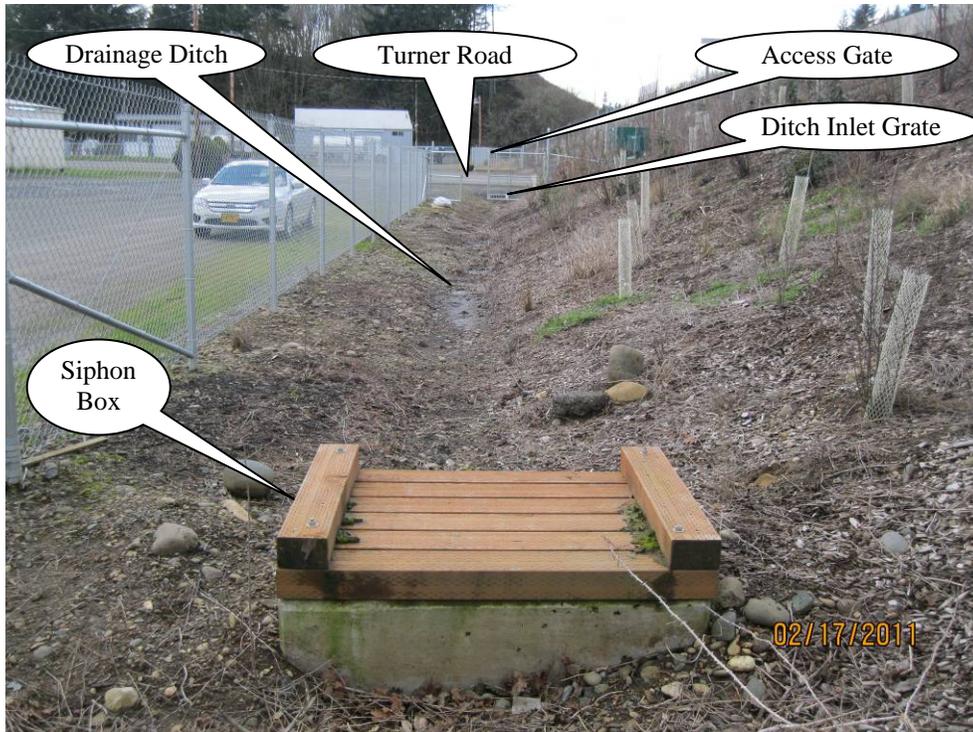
Siphon box connection downstream of the facility. Siphon box drains into ditch towards access gate.
